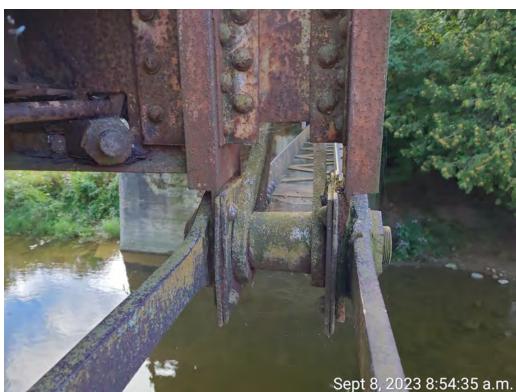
West abutment, south bearing showing dislodged bearing roller pin.
